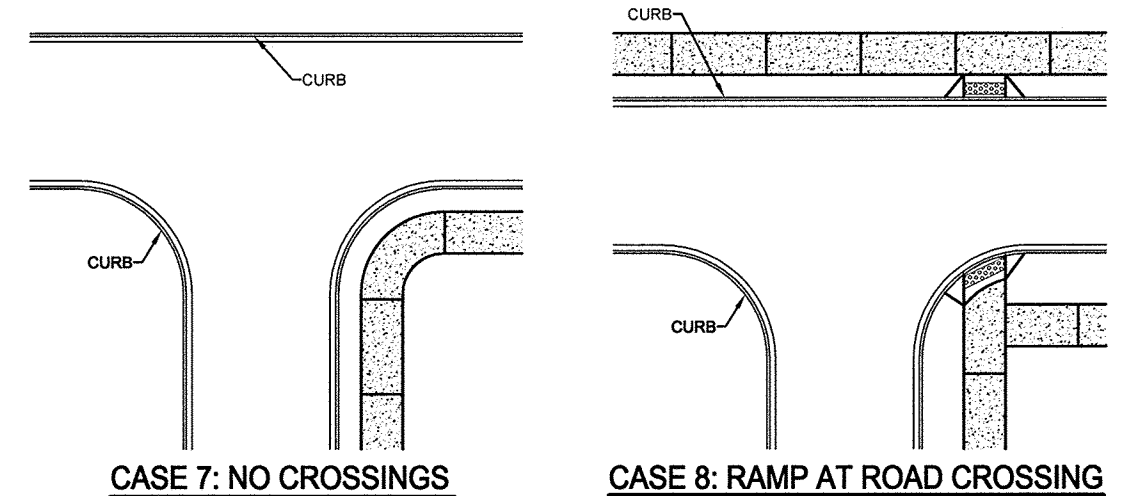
TYPICAL SIDEWALKS AT T-INTERSECTIONS
